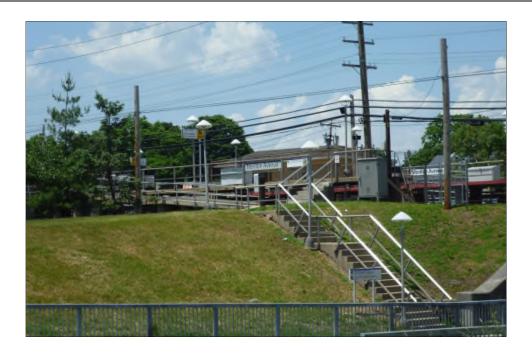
Merillon Avenue Station. Note that the LIRR tracks are on a slight embankment at this location; the slope seen in the foreground is a result of the cut made for the Nassau Boulevard underpass beneath the LIRR tracks.
